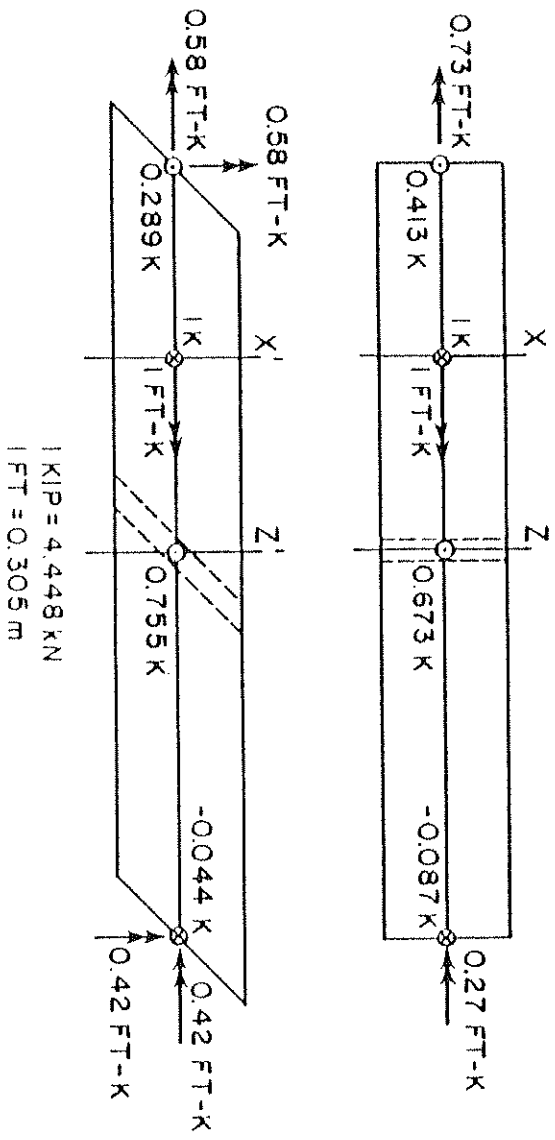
CENTERLINE REACTIONS FOR TWO SPAN STRAIGHT AND SKEW BOX GIRDERS UNDER POINT LOAD ON EXTERIOR GIRDER IN ONE SPAN
